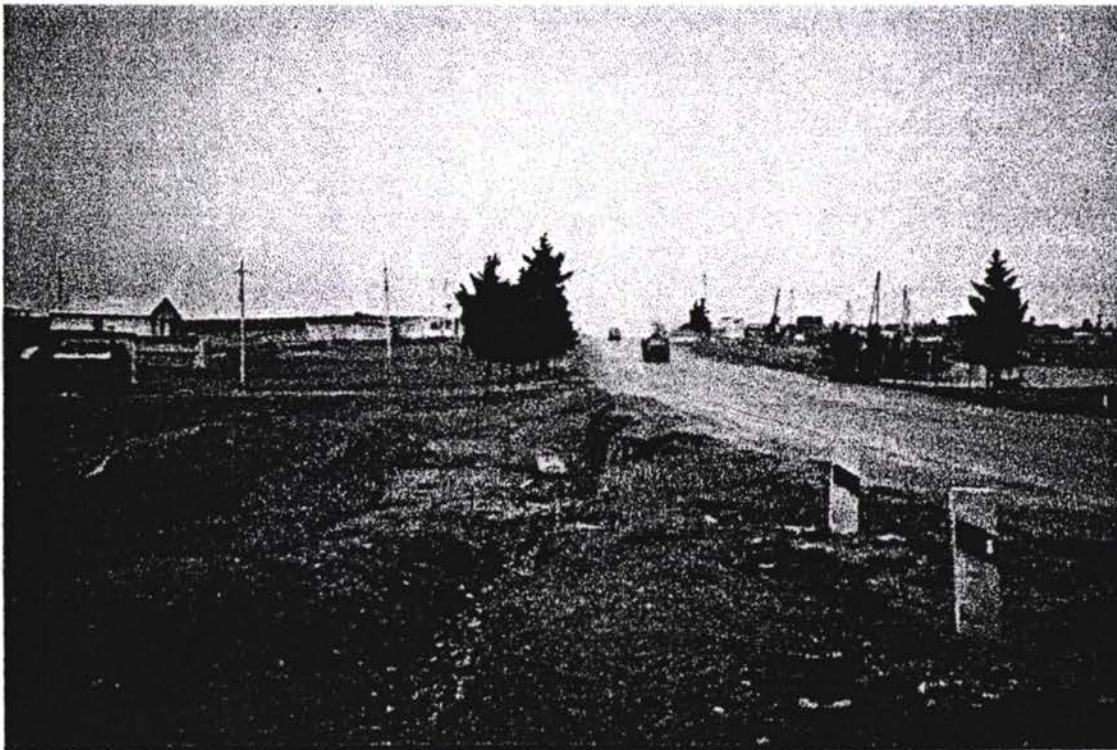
Example of possible dangerous dig and erosion at the road embankment
